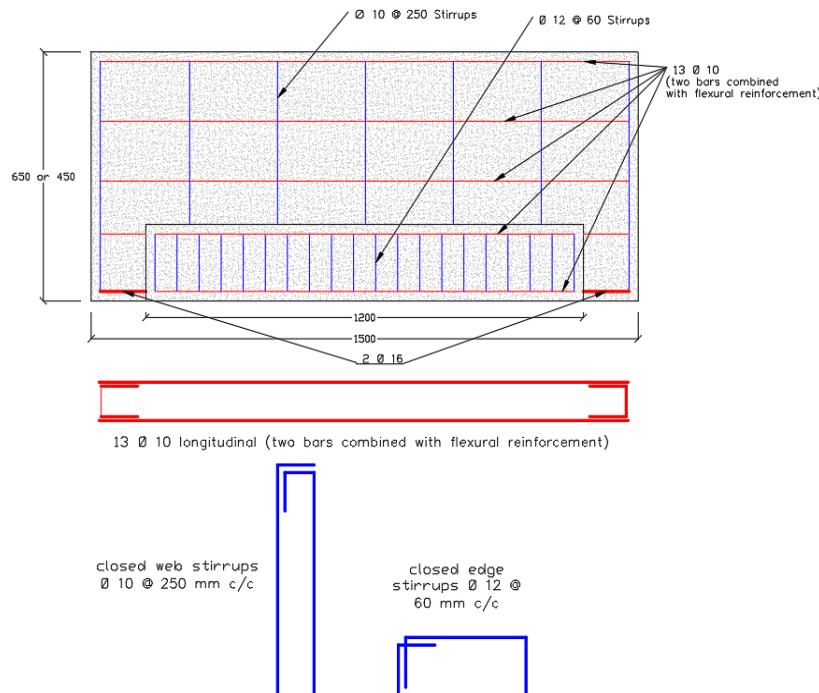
Reinforcement details of tested specimens (all dimensions are in mm)
